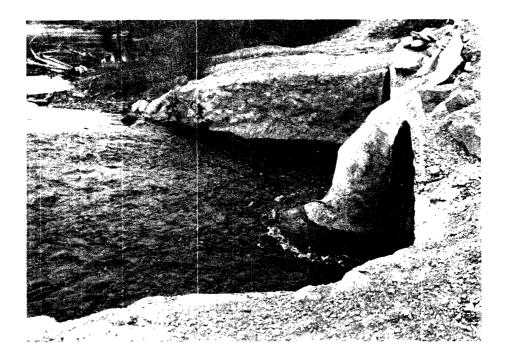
Culverts installed in a nearly horizontal position, stream flow affected at culvert entrances. Marshall Creek, Alaska Highway, km 1619. Highway to be reconstructed.
